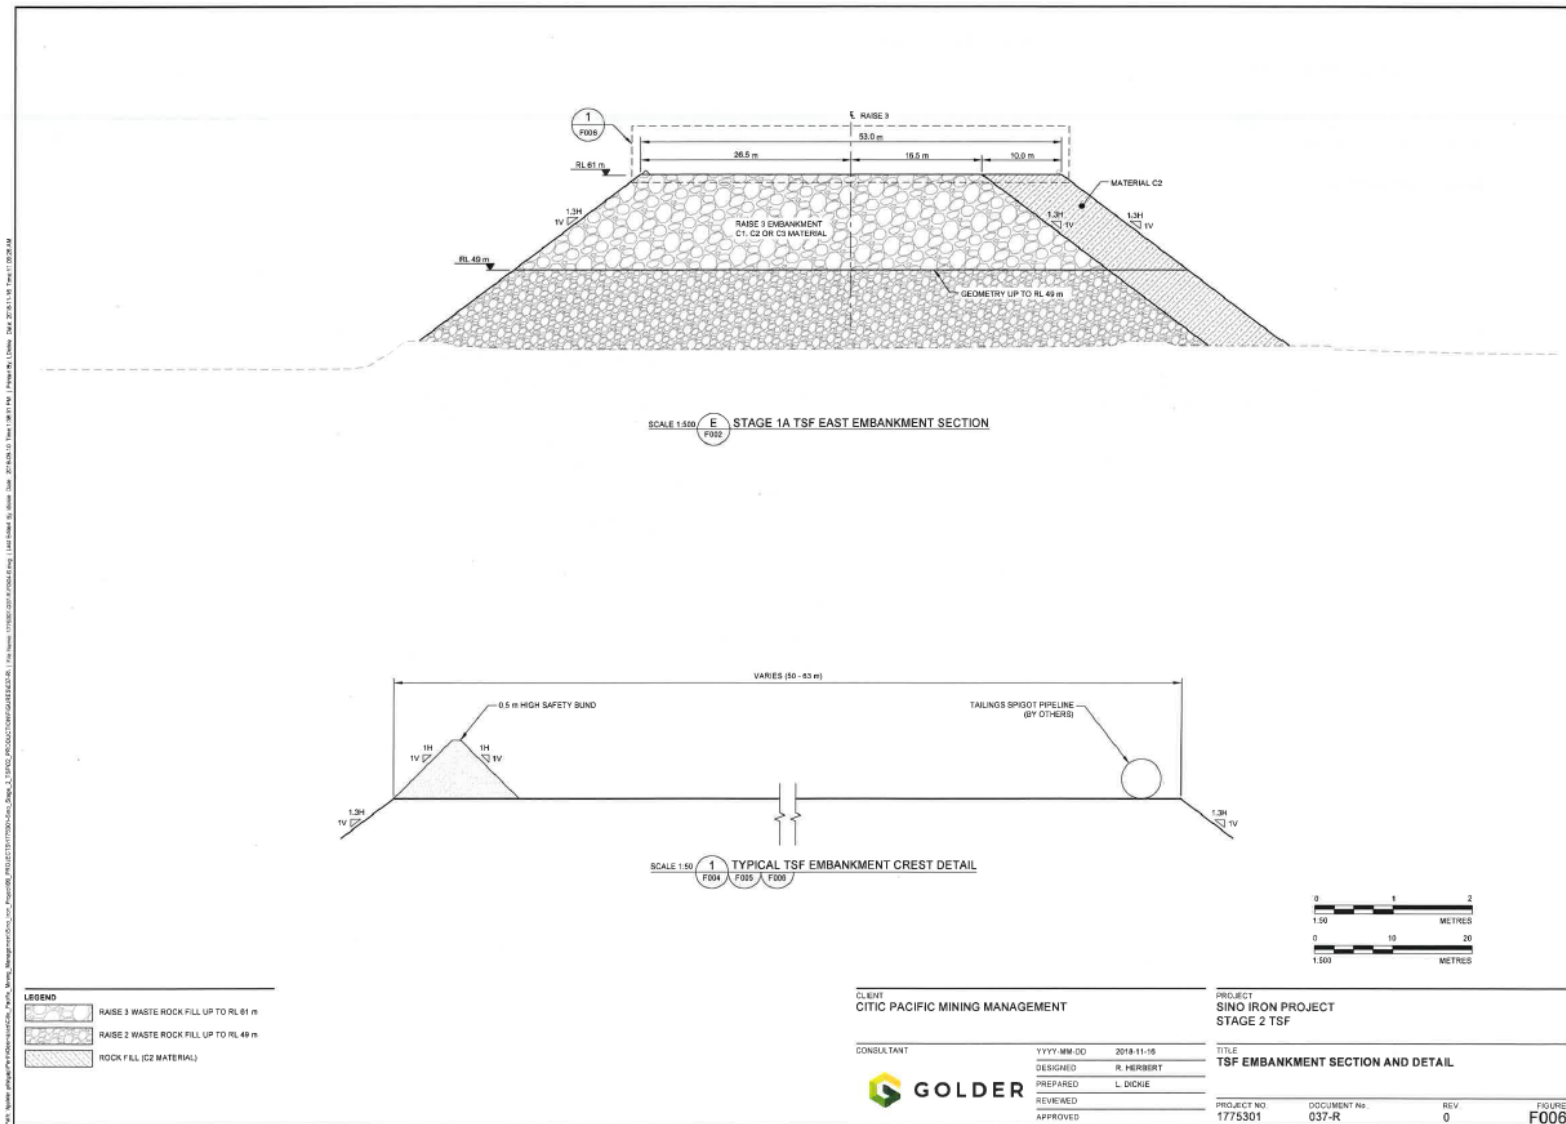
TSF Embankment Section, east, and detail (CITIC Design Drawings, 2019)
